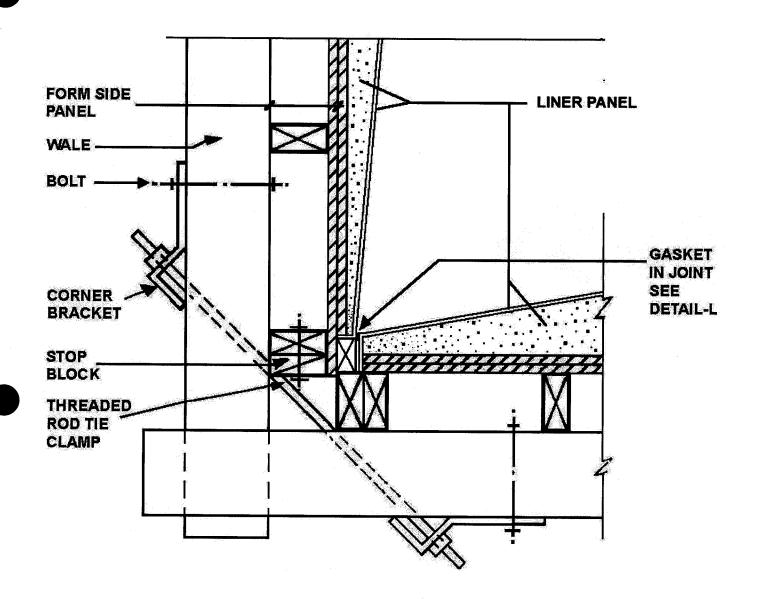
HOROZONTAL CONSTRUCTION JOINT FORM ASSEMBLY SECOND PLACEMENT
